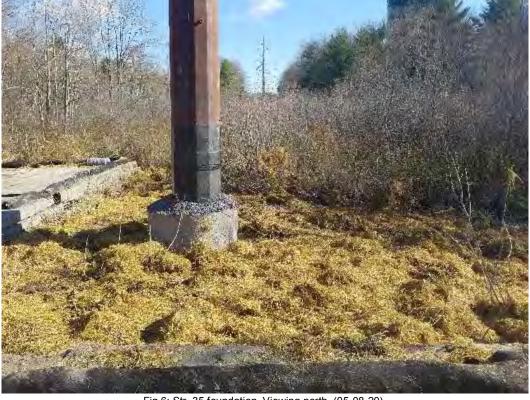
Str. 35 foundation. Viewing north. (05-08-20).
